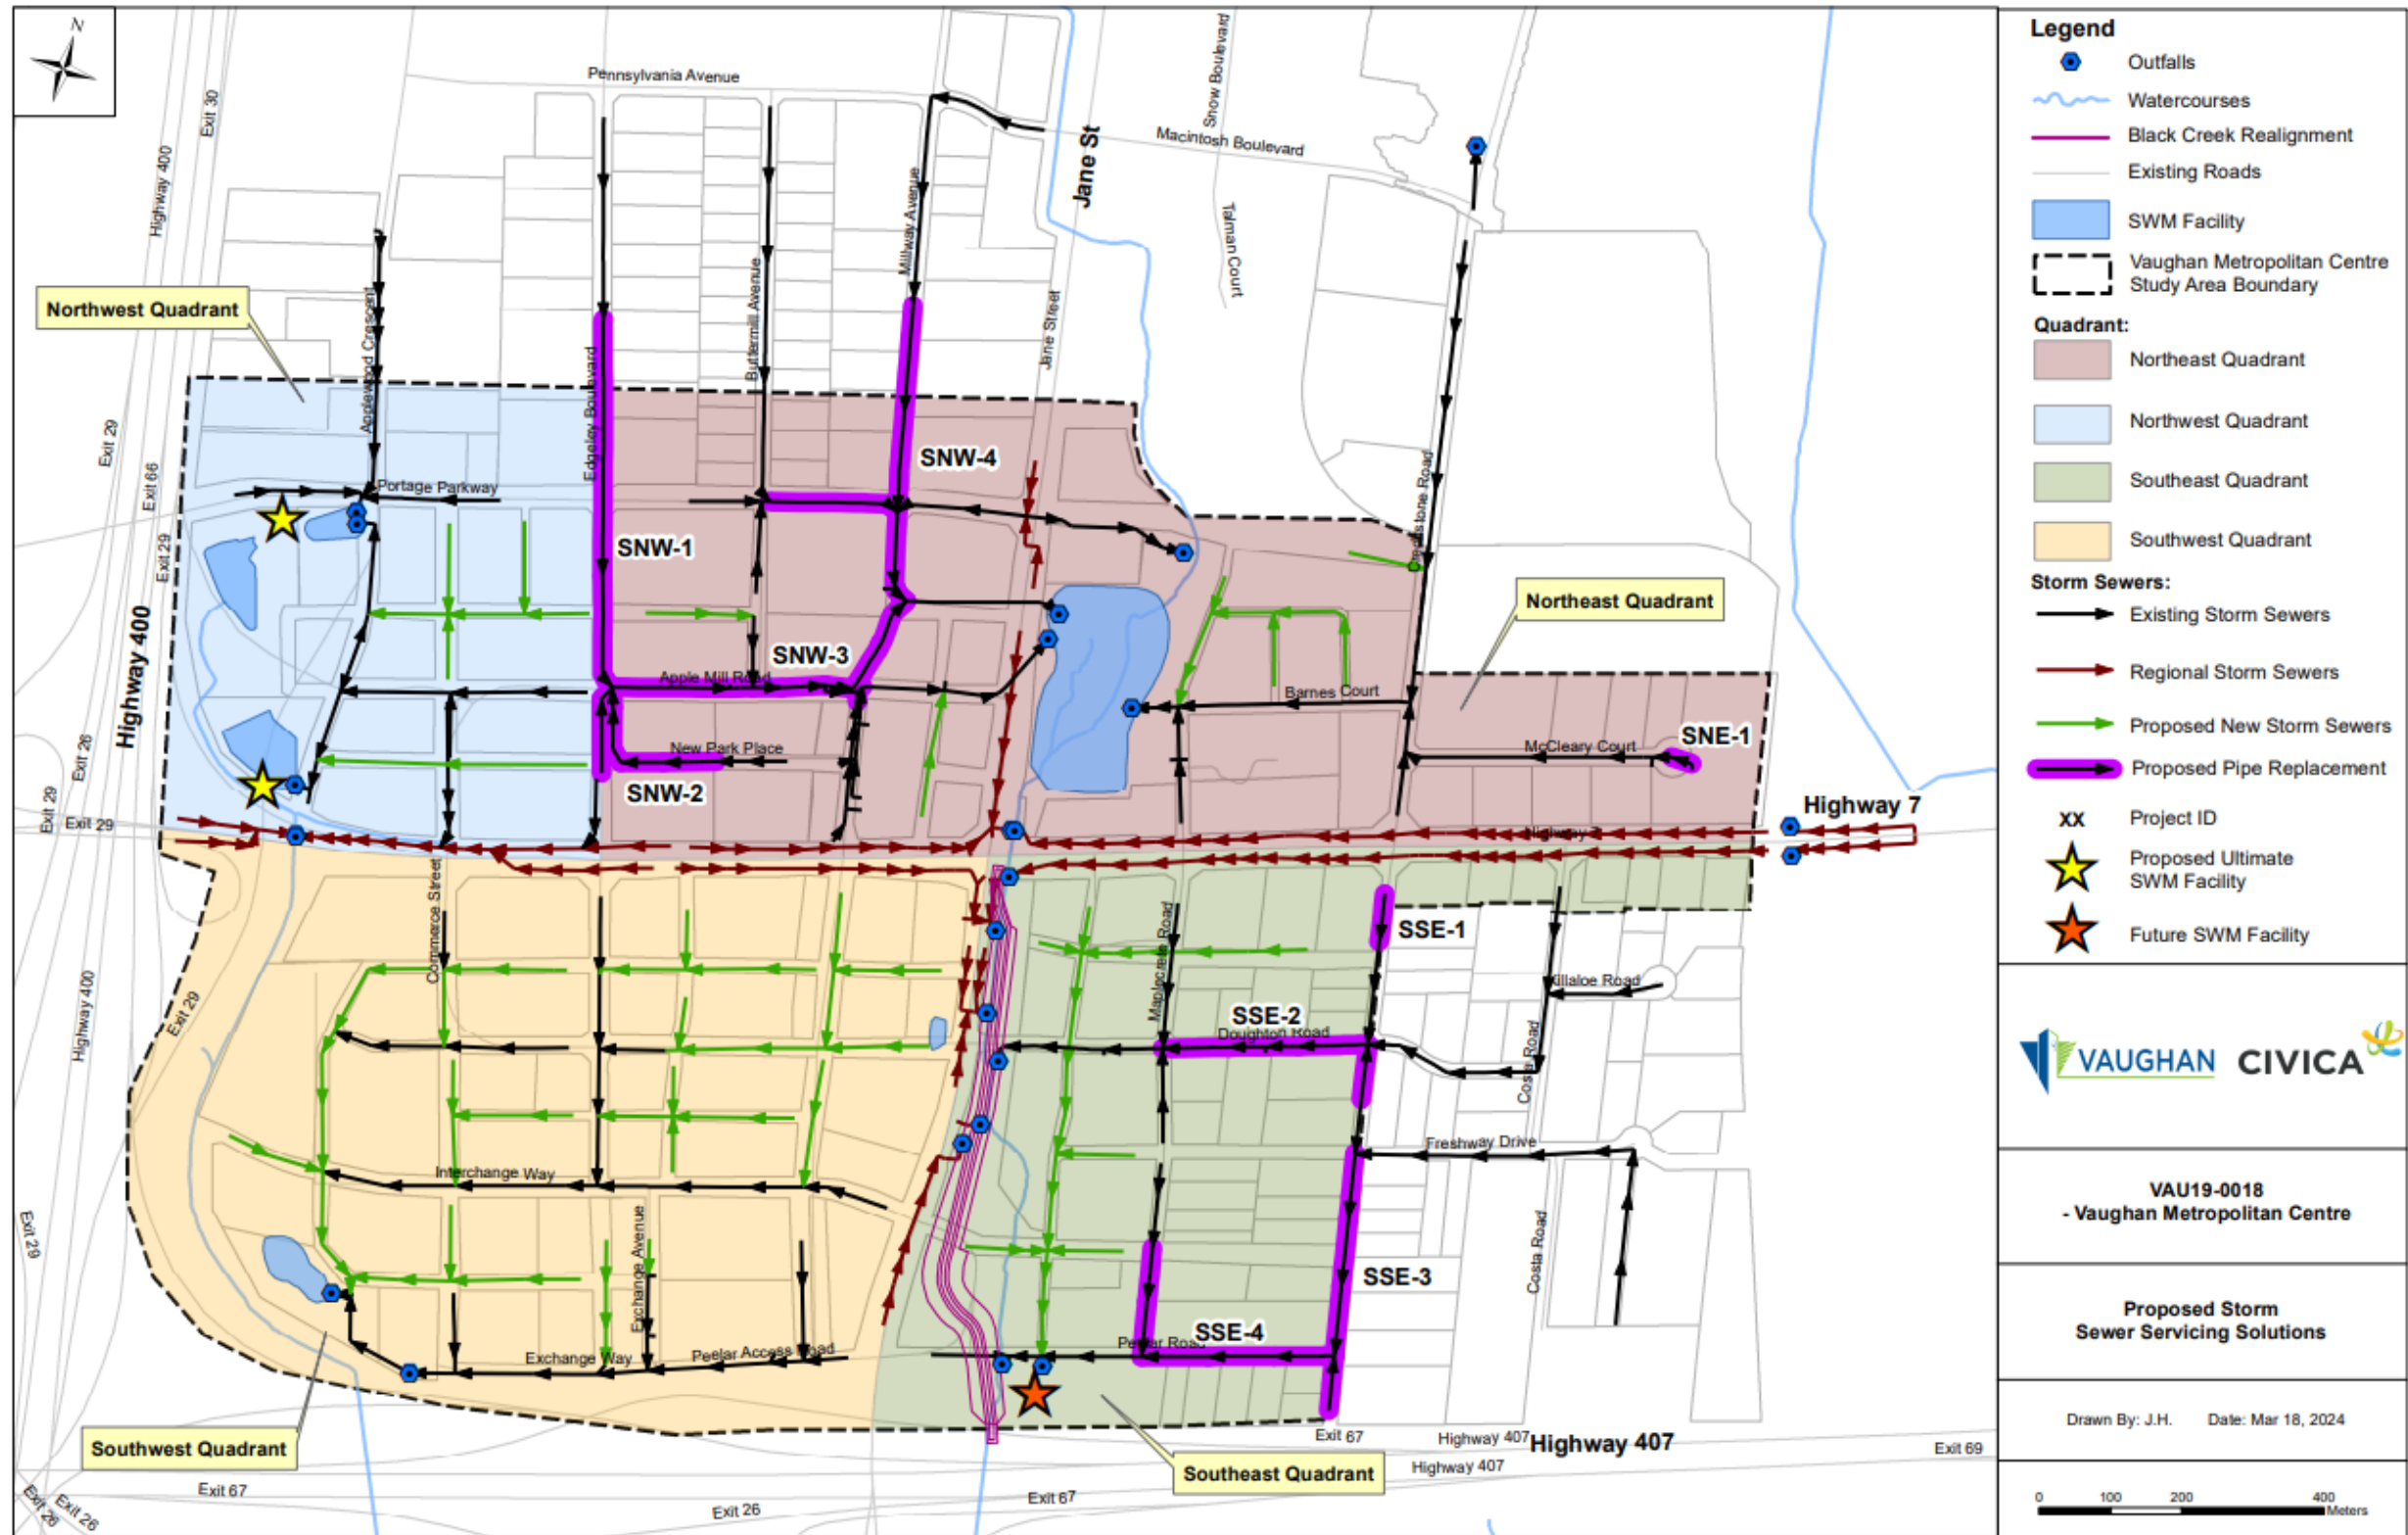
Vaughan Metropolitan Centre Proposed Solutions
